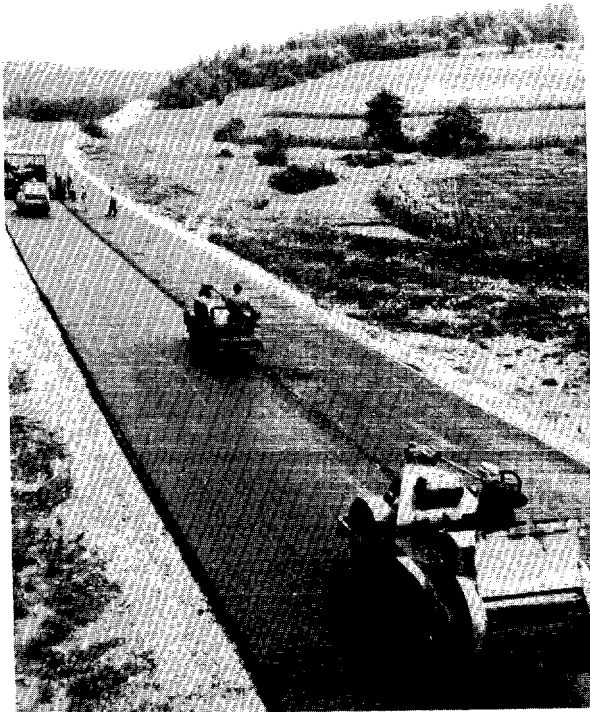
Construction on Ljubljana-Zagreb super-highway, showing part of the up-to-date equipment used in constructing the road.
